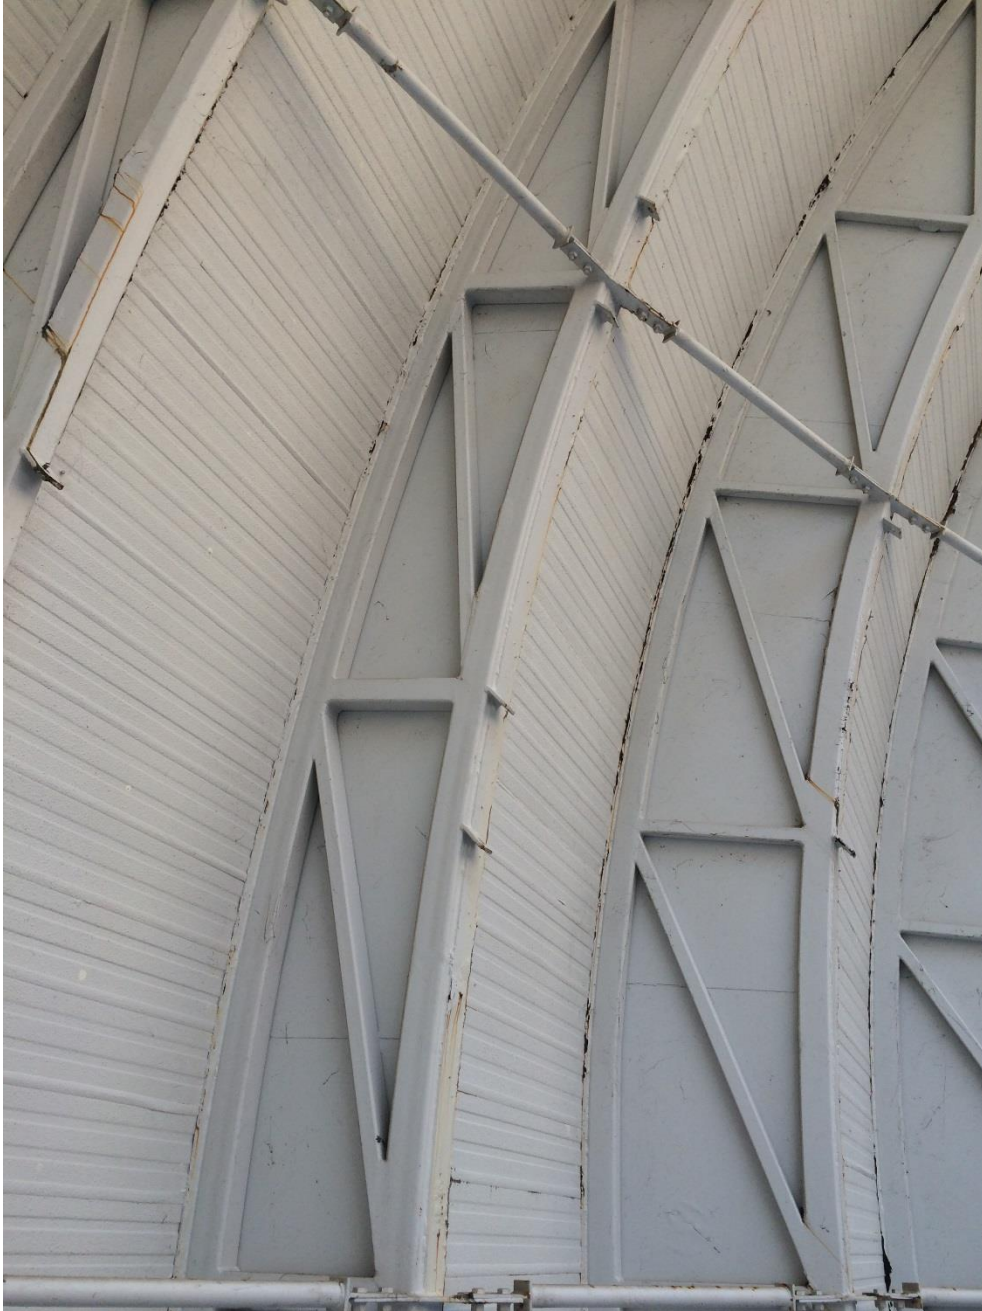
Minor corrosion to truss top and bottom plate
